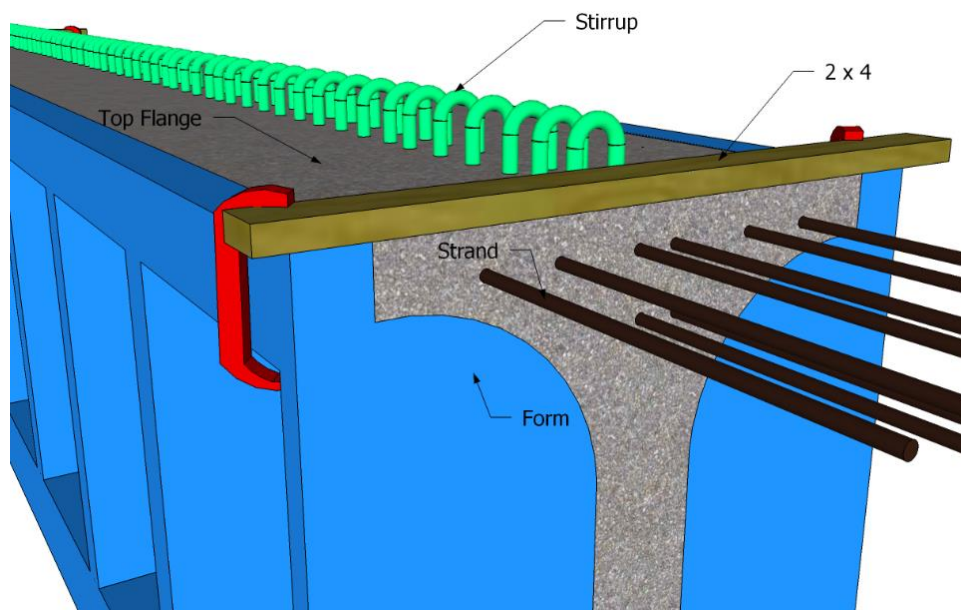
Close-up of a 2x4 positioned on a PPCB
